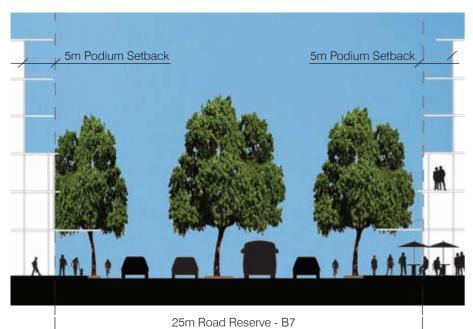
West Ipswich Streetscape : Brisbane Street aa
